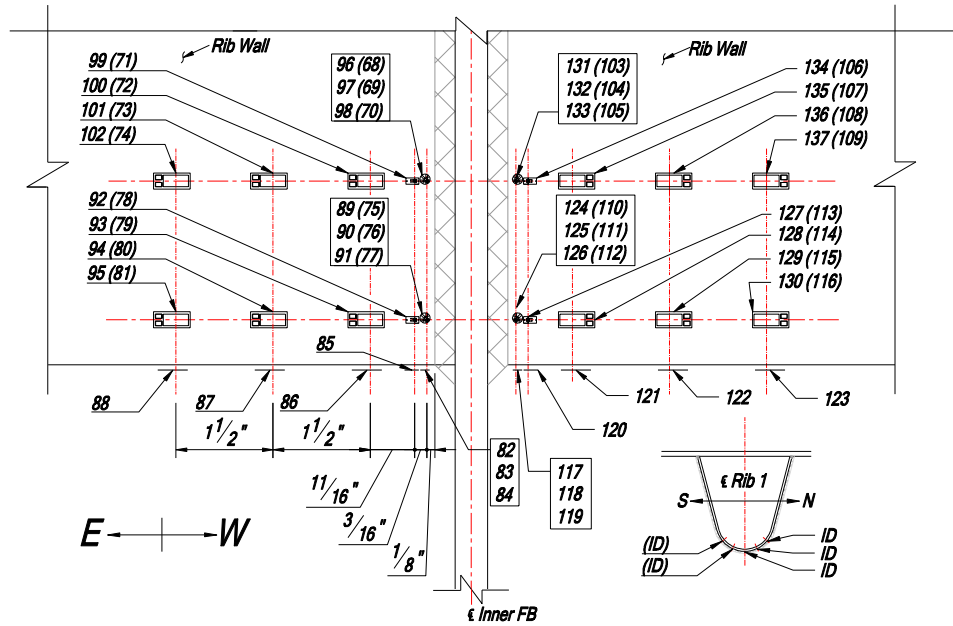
Gauges on deck plate at section Z-Z (Detail B is similar to Detail A but handed)
